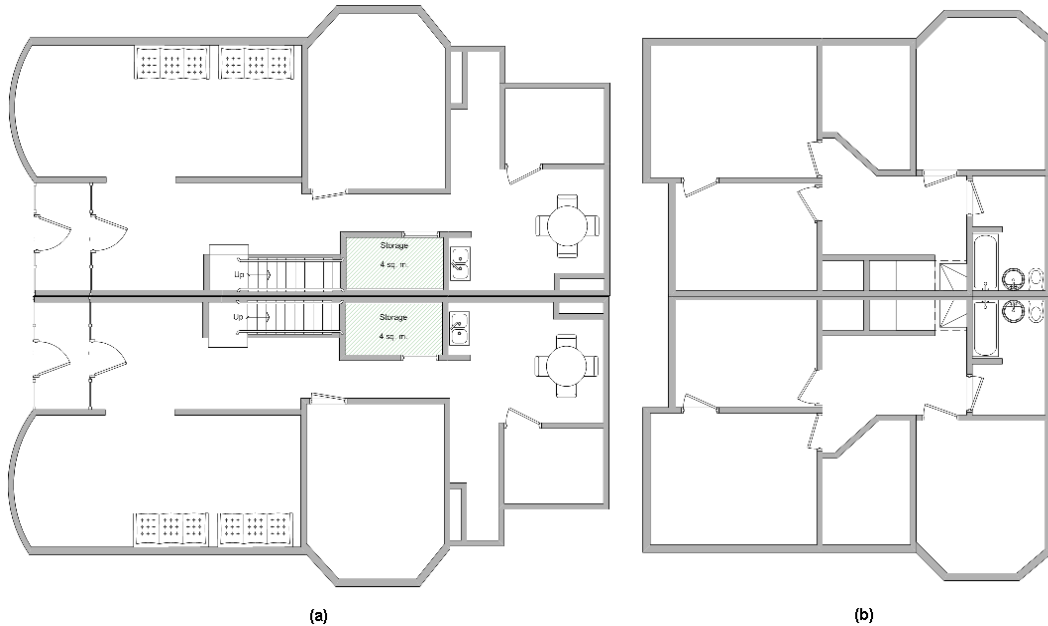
Floorplan of 15 and 17 Schussler Rd., Worcester, MA.(a) First floor (b) Second Floor
